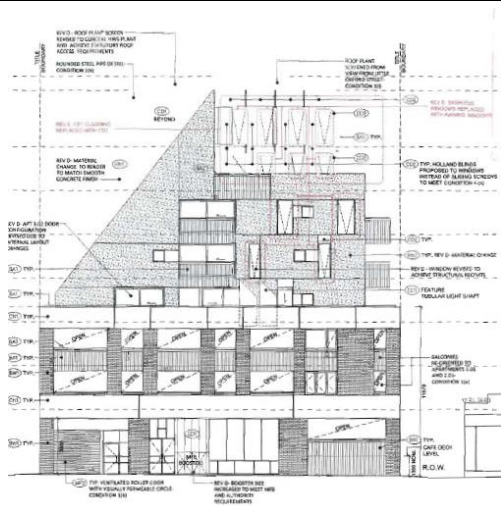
Little Oxford Street Elevation of No. 7-15 Little Oxford Street, Collingwood
